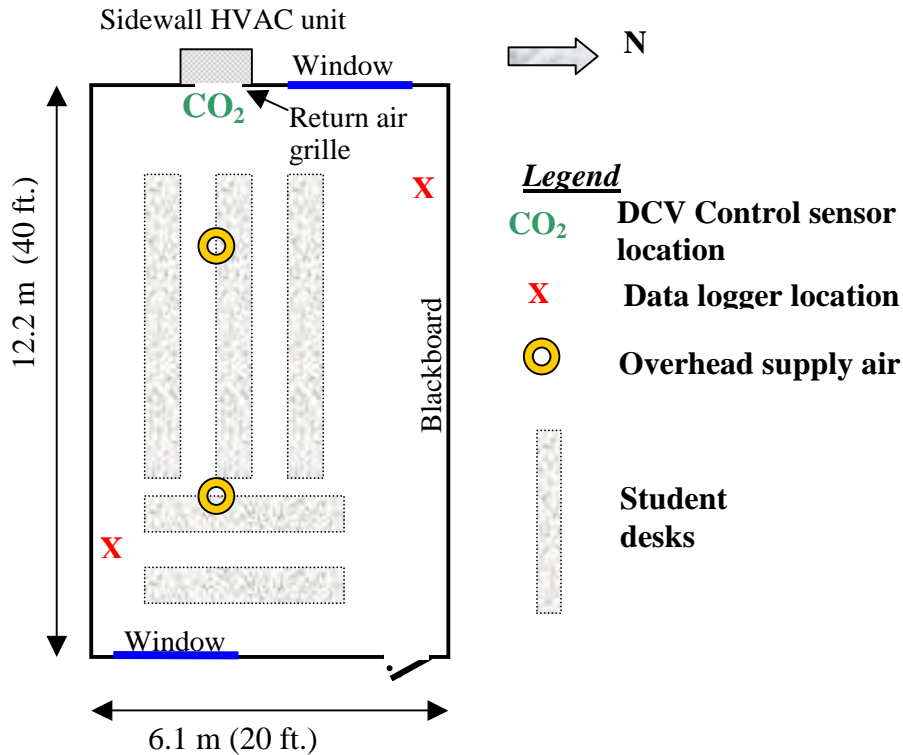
Test Rooms Floor Plan and CO₂ Sensor Location
